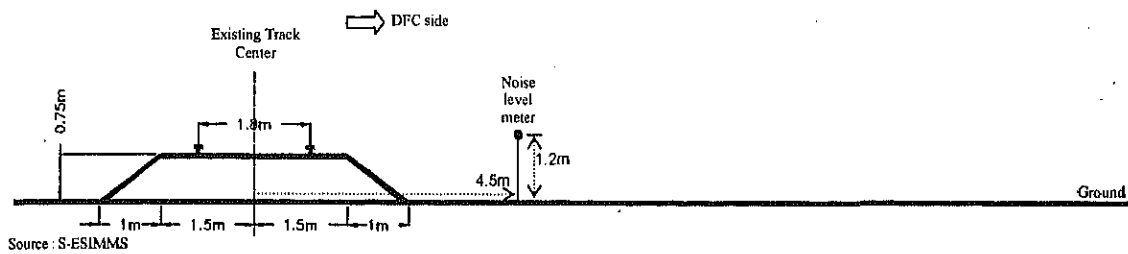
Cross-section view of N-2 Measurement Site in Narnaul
